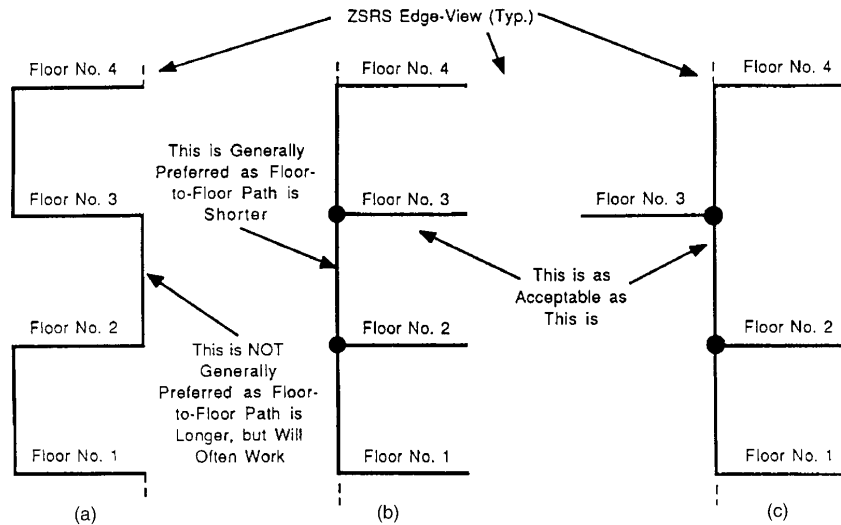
Edge view of several SRS installations that are continuous and routed between floors of a facility
